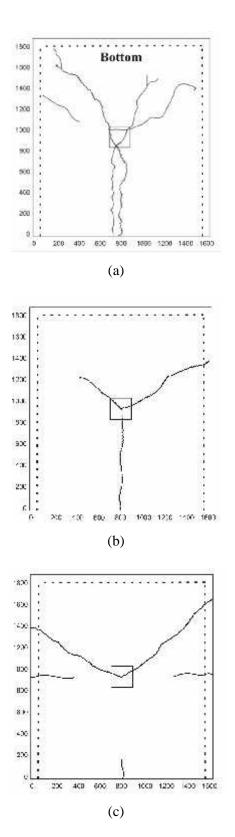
Crack pattern at (a) Normal Slab, (b) Alkadeck type, (c) ISD type
